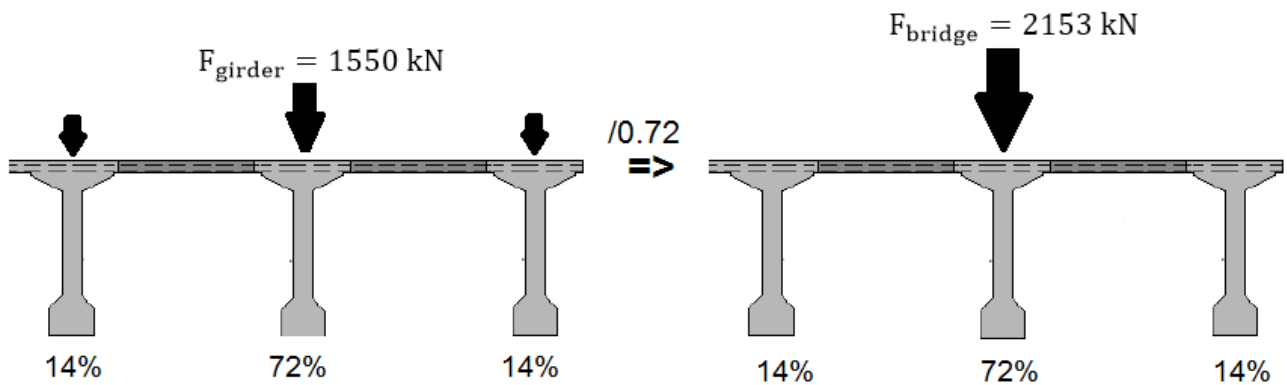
converting load on single girder, top, to equivalent bridge load, bottom
